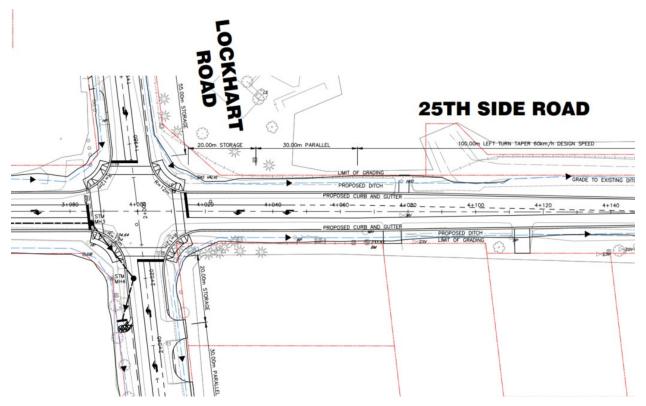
Extract from Lockhart Road and 25th Side Road Intersection Improvements project, April 2021
